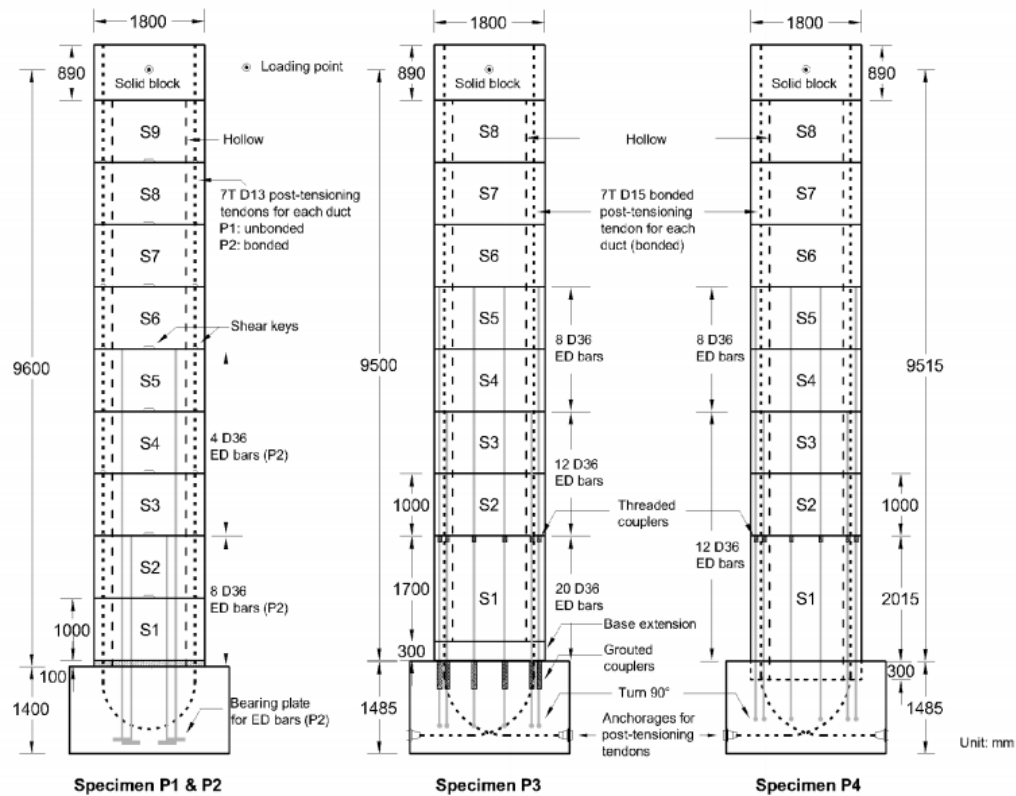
Elevation of specimens tested by Ou et al. 2006
